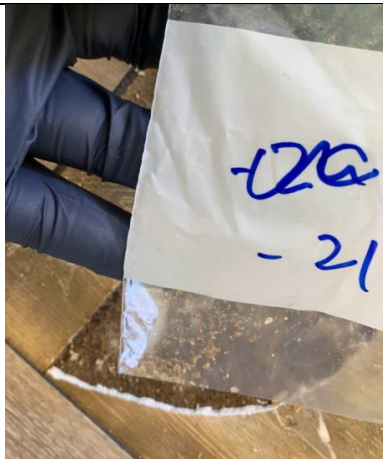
Photo of HA number 7, Non-ACM Floor Tile Mastic, Throughout Floors Under Tiles of Crafts Room, Office and Storage
